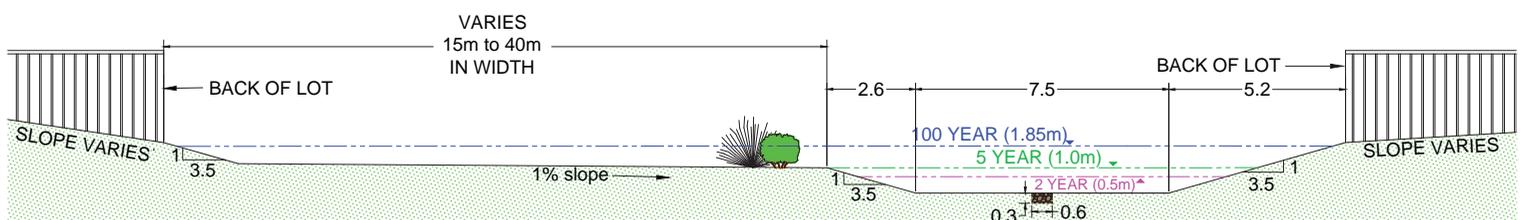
Typical Linear Park & Landscaped Drainage Parcel Cross Section
